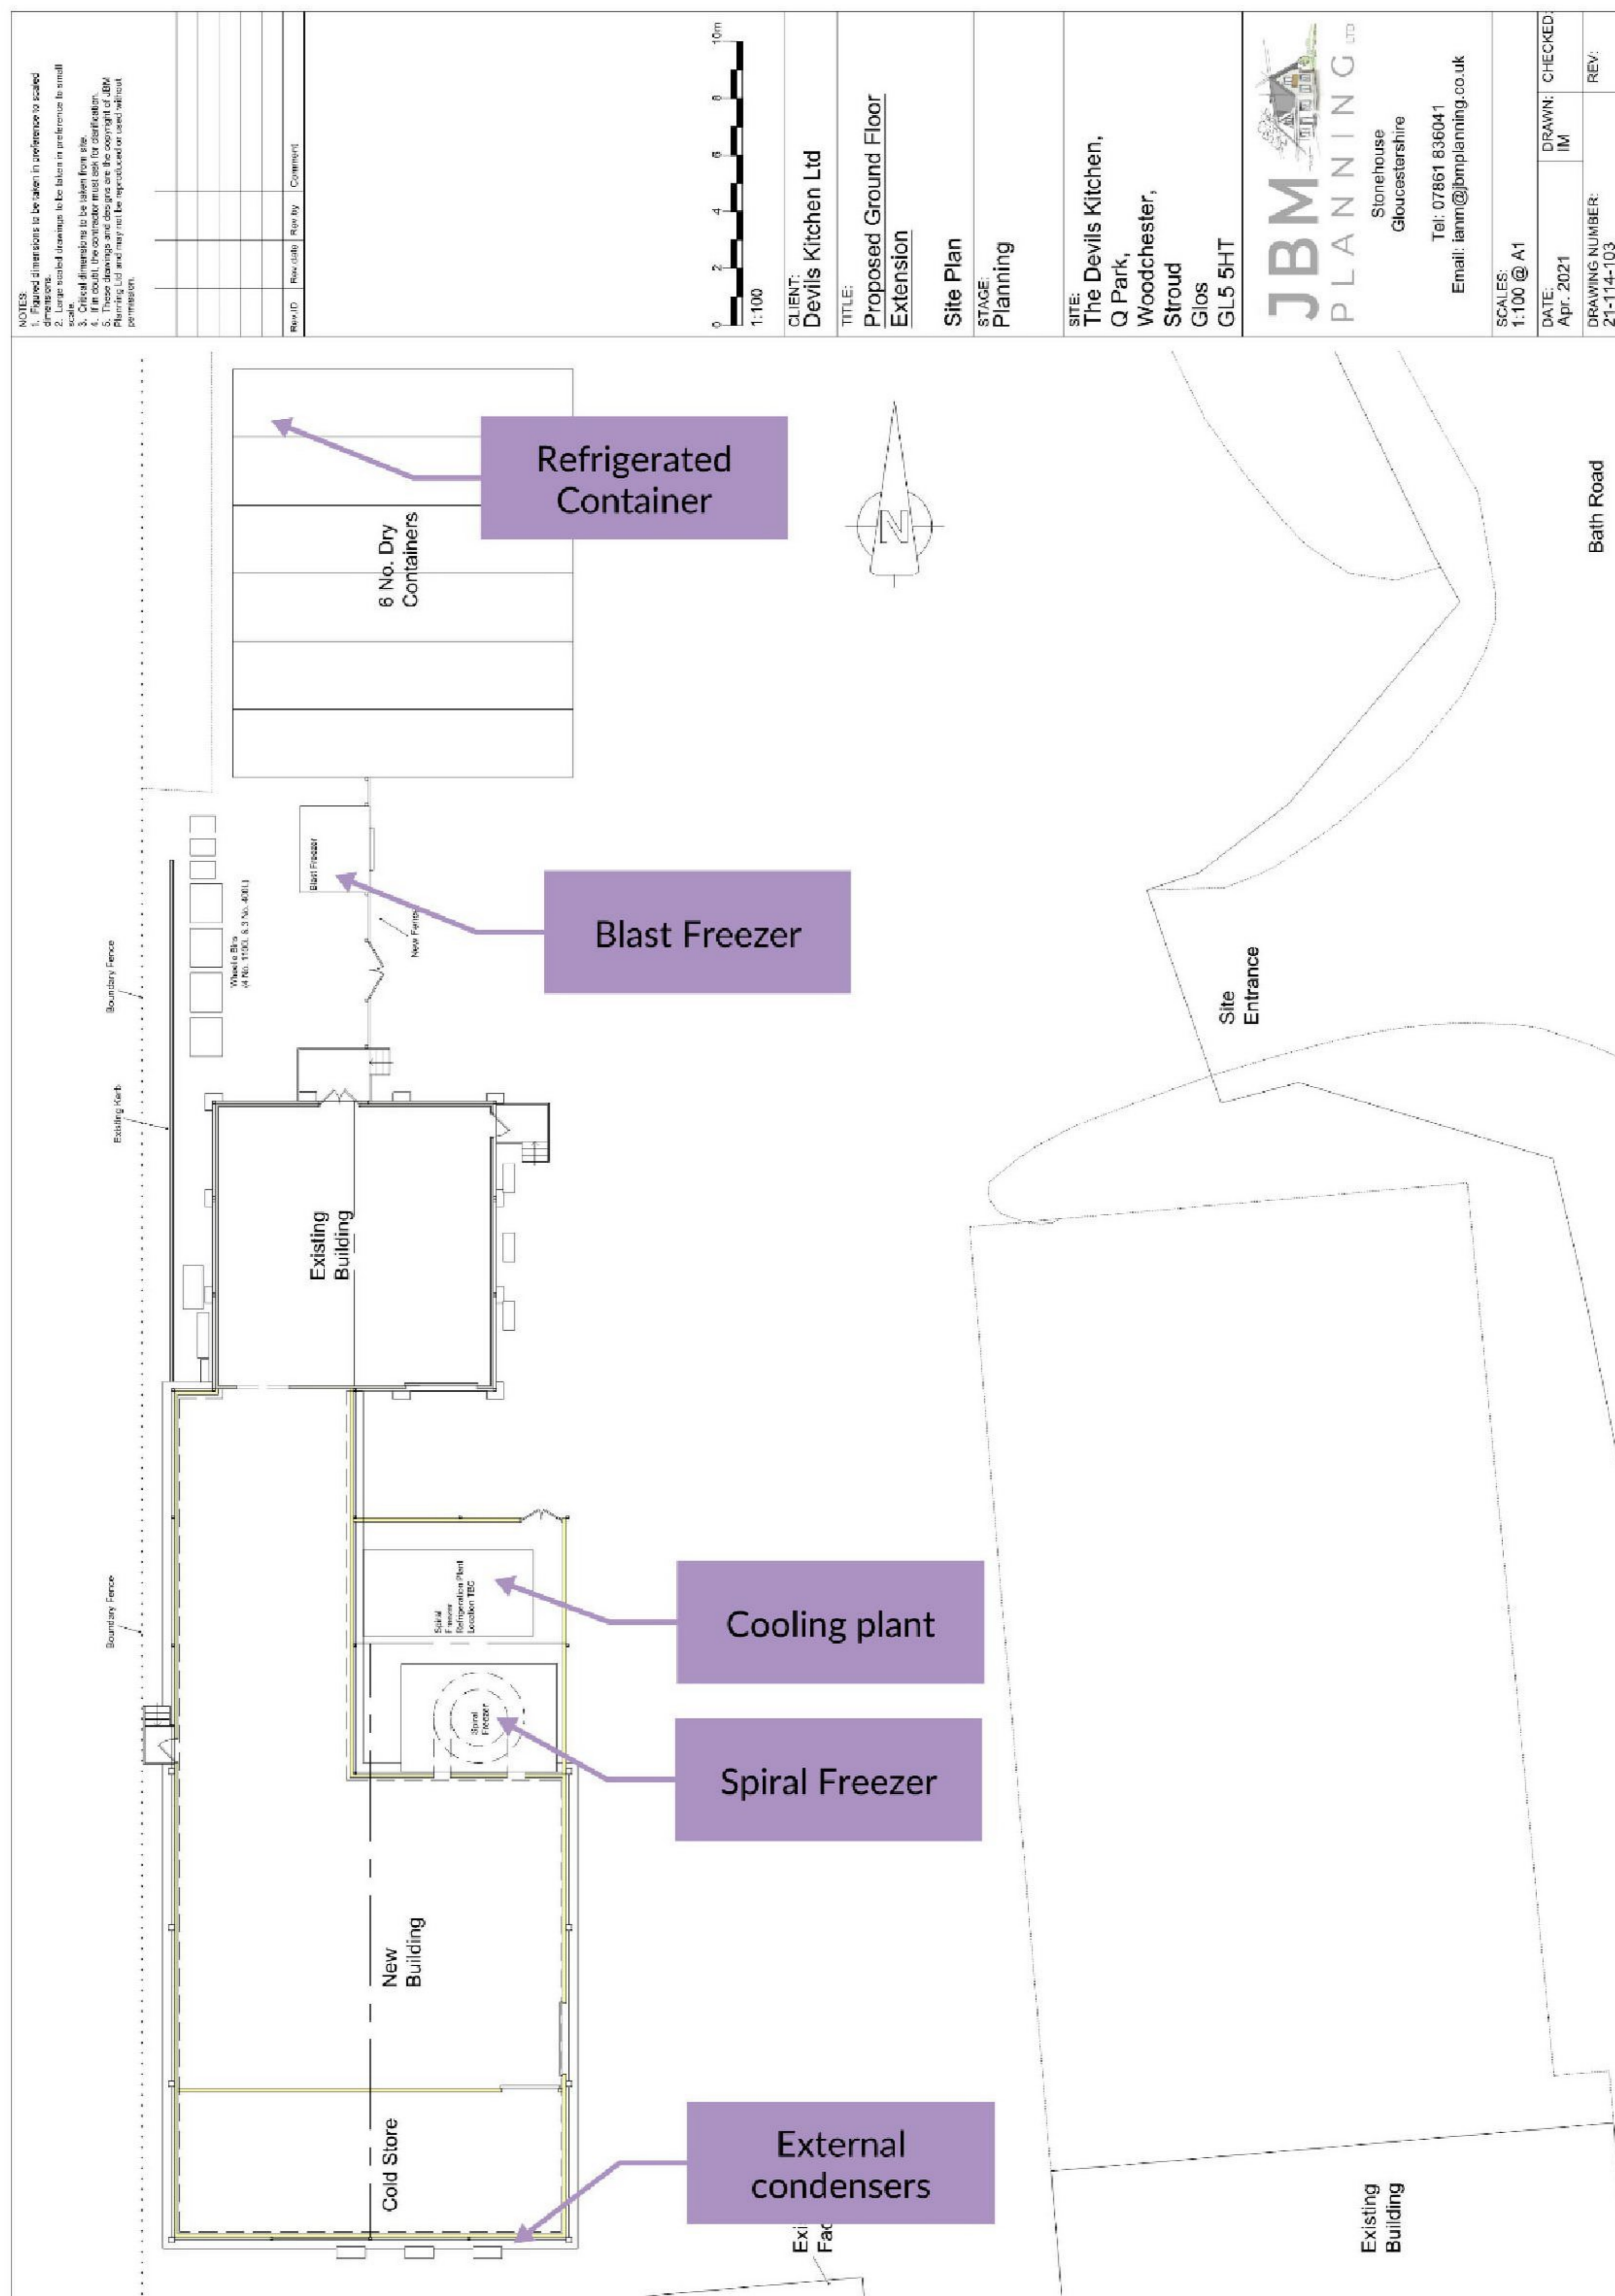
Proposed development site drawing showing the location of the proposed externally located plant.
